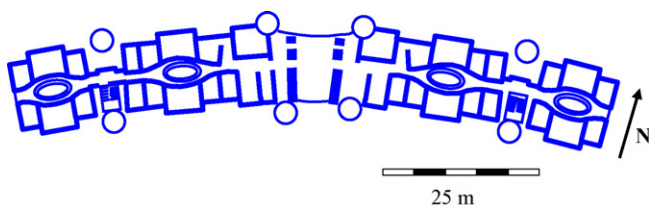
Schematic plan view of second storey of rammed earth office building.
